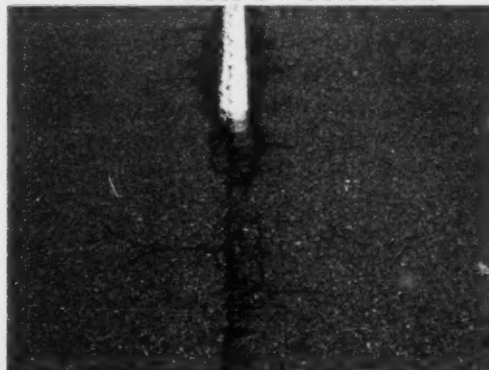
(below) shows an example of pavement deterioration originating at the joint between the left and right lanes.
